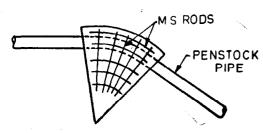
UMBRELLA TYPE ANCHOR BLOCK
